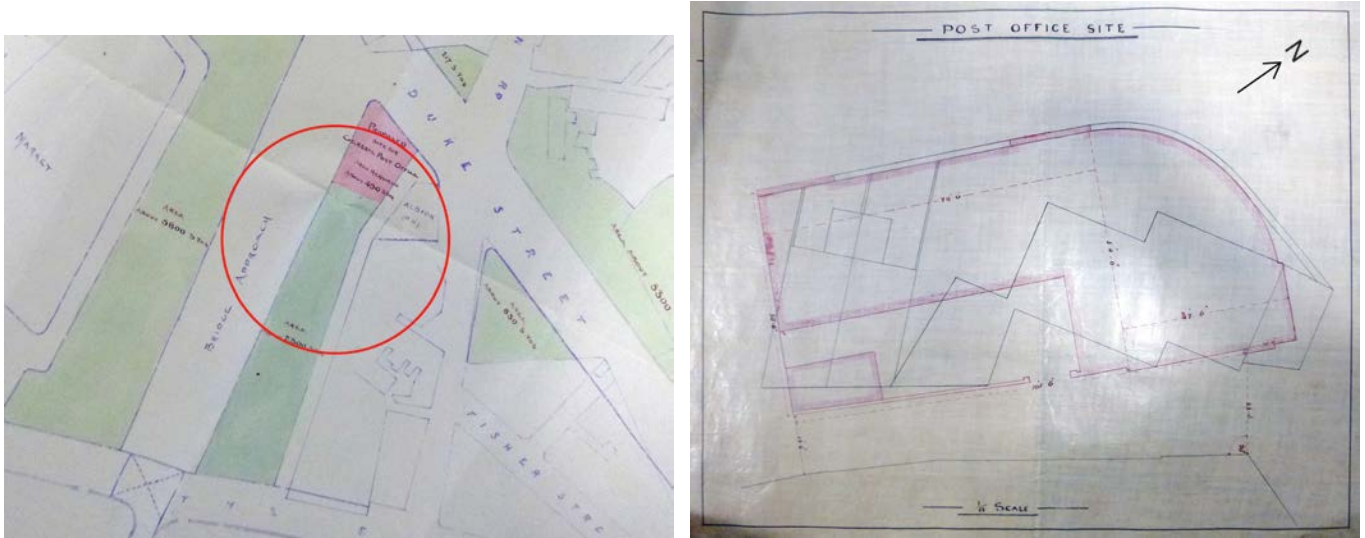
(left): Extract from the proposed site location plan for the General Post Office of 1883
